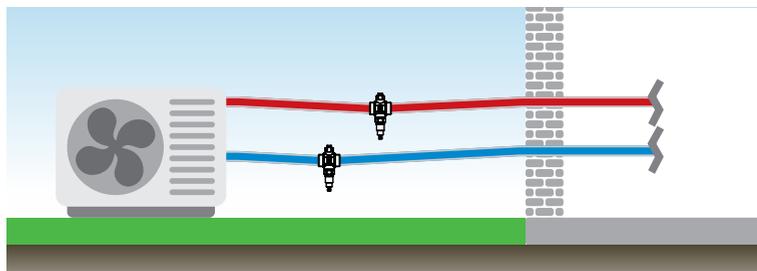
ACCEPTABLE INSTALLATION POSITION AND PIPE ROUTING IN THE SYSTEM
